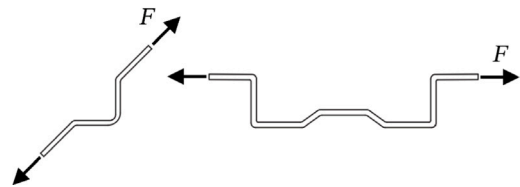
Extraction of small-scale specimens from full-scale sections.
